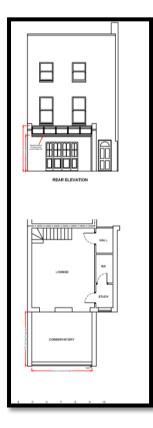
Plans of the property to the rear of the application site. The staircase is where the window facing the application site is sited, as can be seen this window would bring light to the staircase area.
